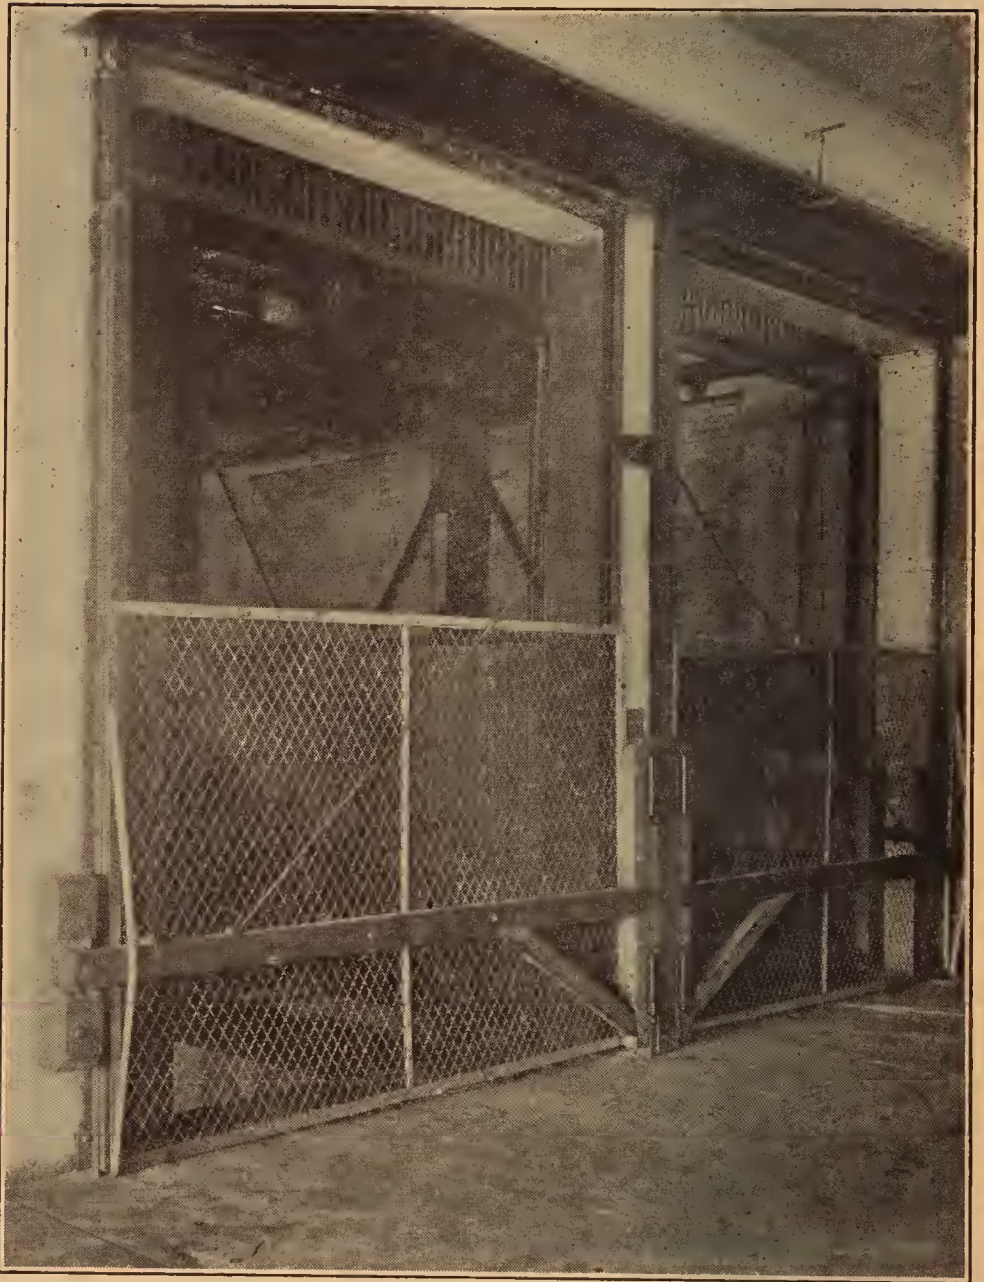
GARAGE ELEVATOR GATES AS INSTALLED FOR A DOUBLE SHAFTWAY.
